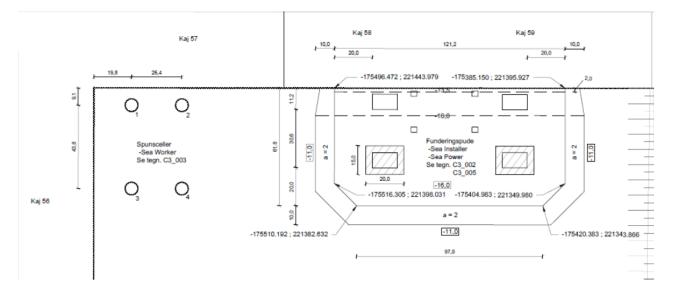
Stone bed arrangement (2 positons) from Port of Grenaa.
